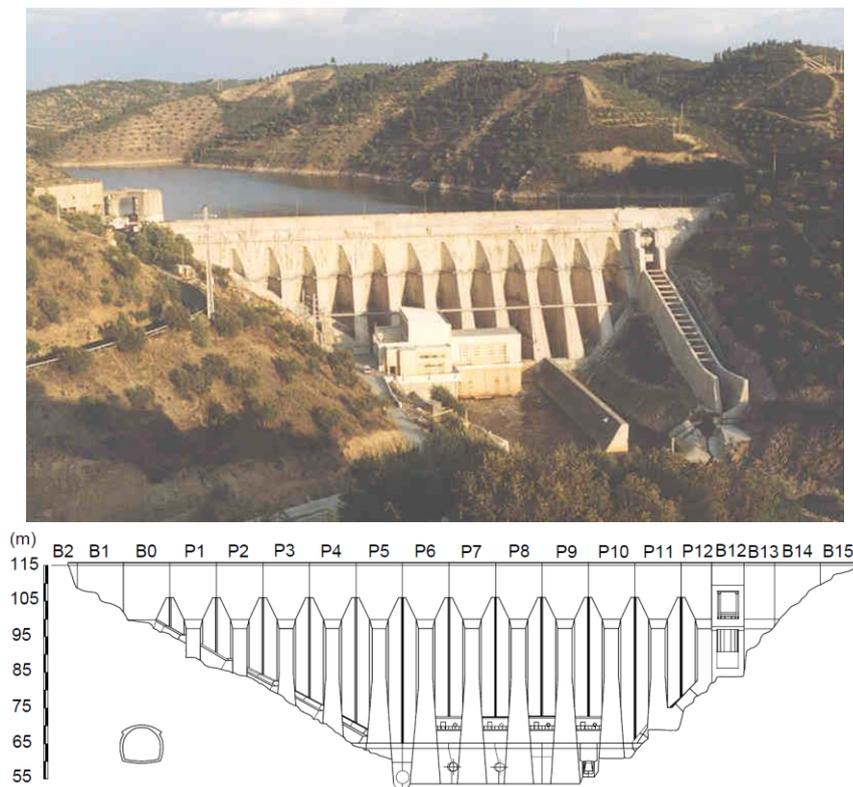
Pracana dam. Downstream view and elevation in 1992, after the rehabilitation works
